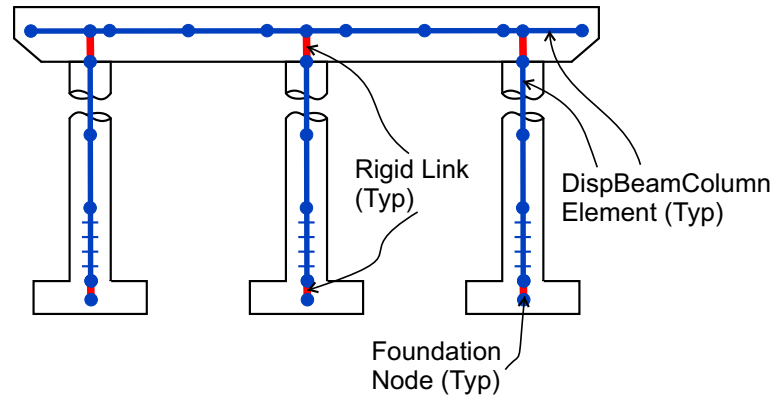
Discretization of Multi-Column Concrete Bridge Bent.
